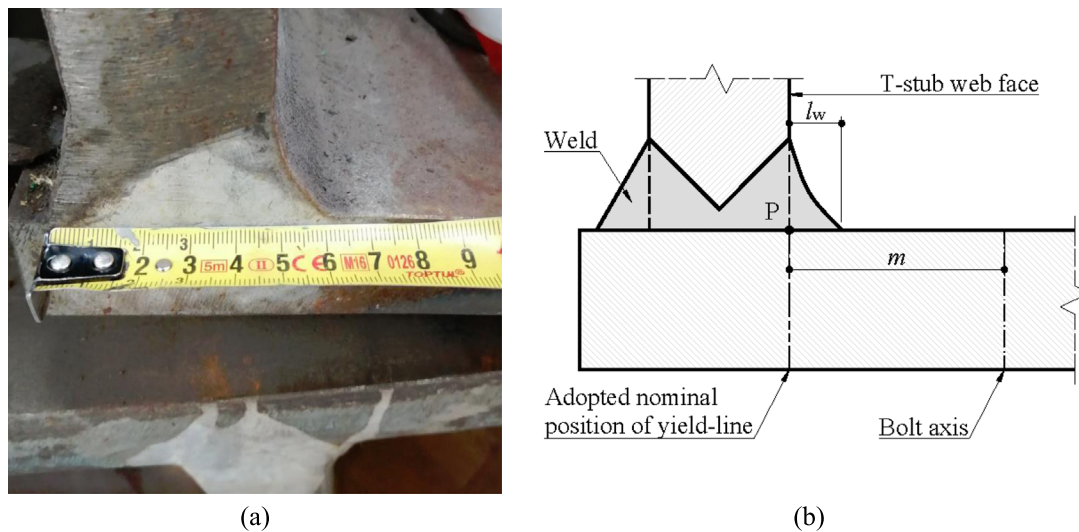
Butt welds with superimposed fillet welds: (a) specimen; (b) assumed position of yield-line.
